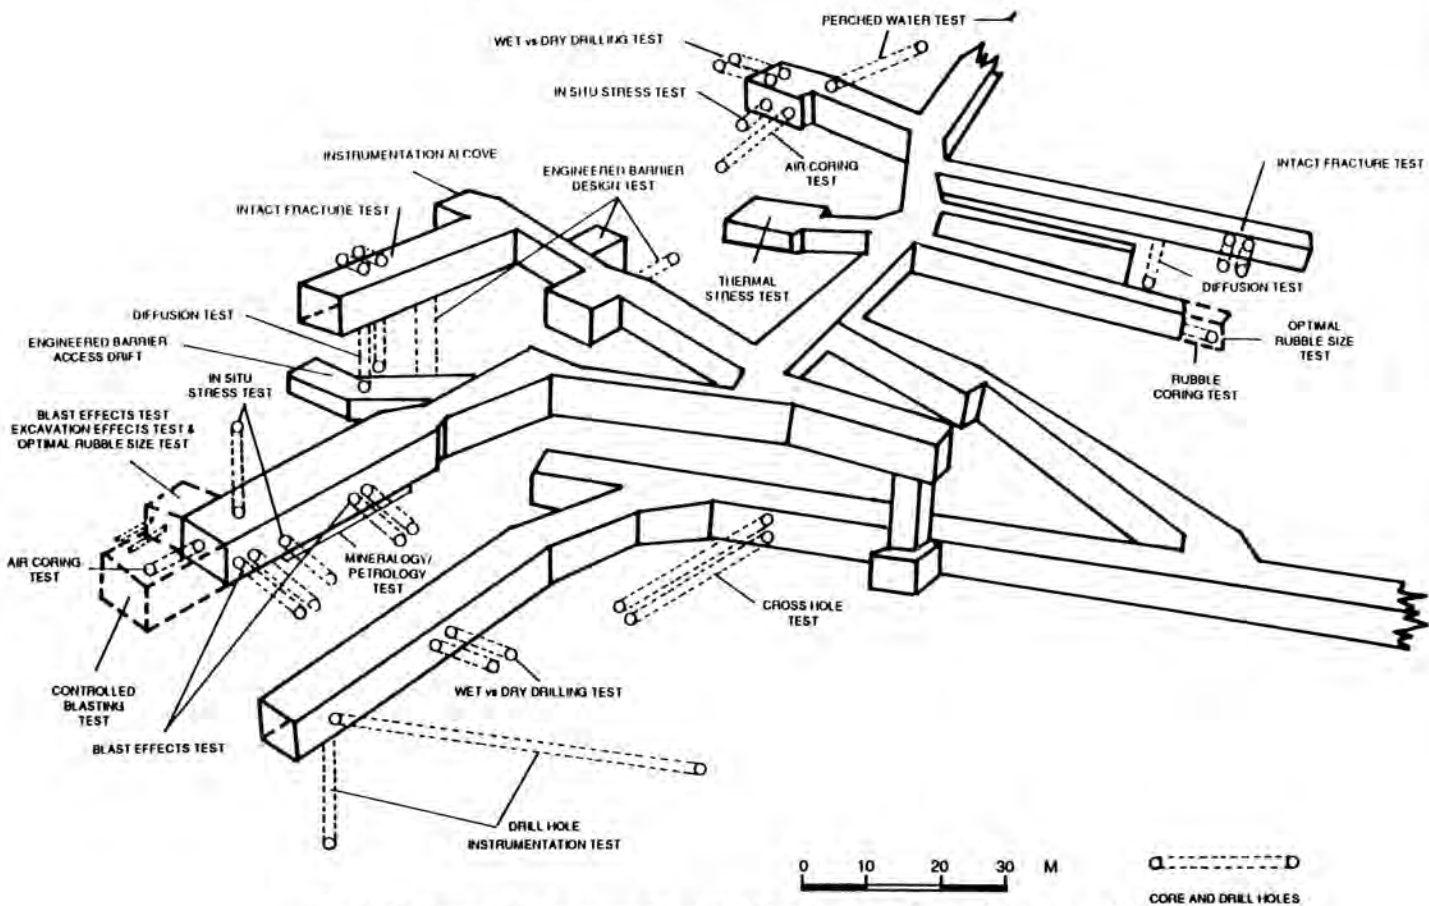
G-Tunnel Underground Facility Showing Locations of Prototype Tests.
